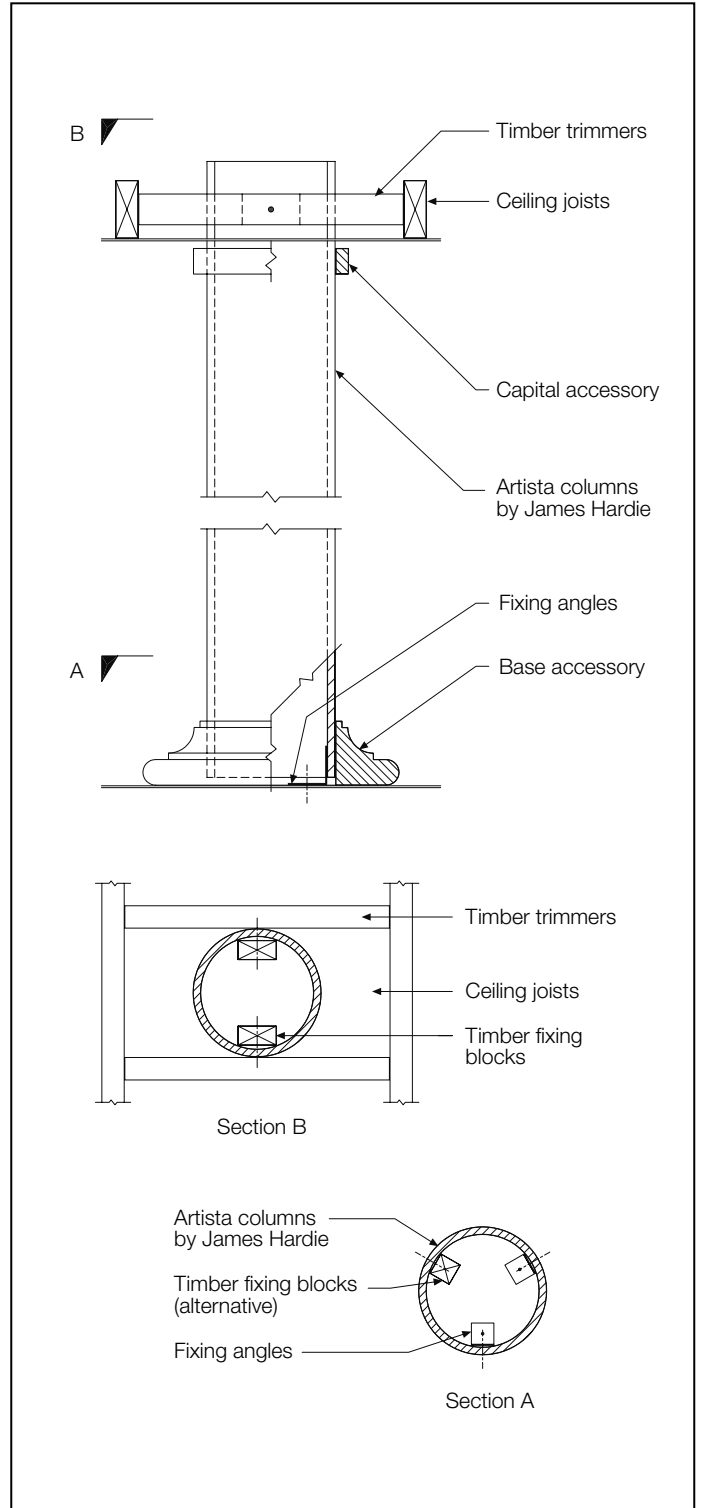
TYPICAL DECORATIVE FIXING DETAIL
